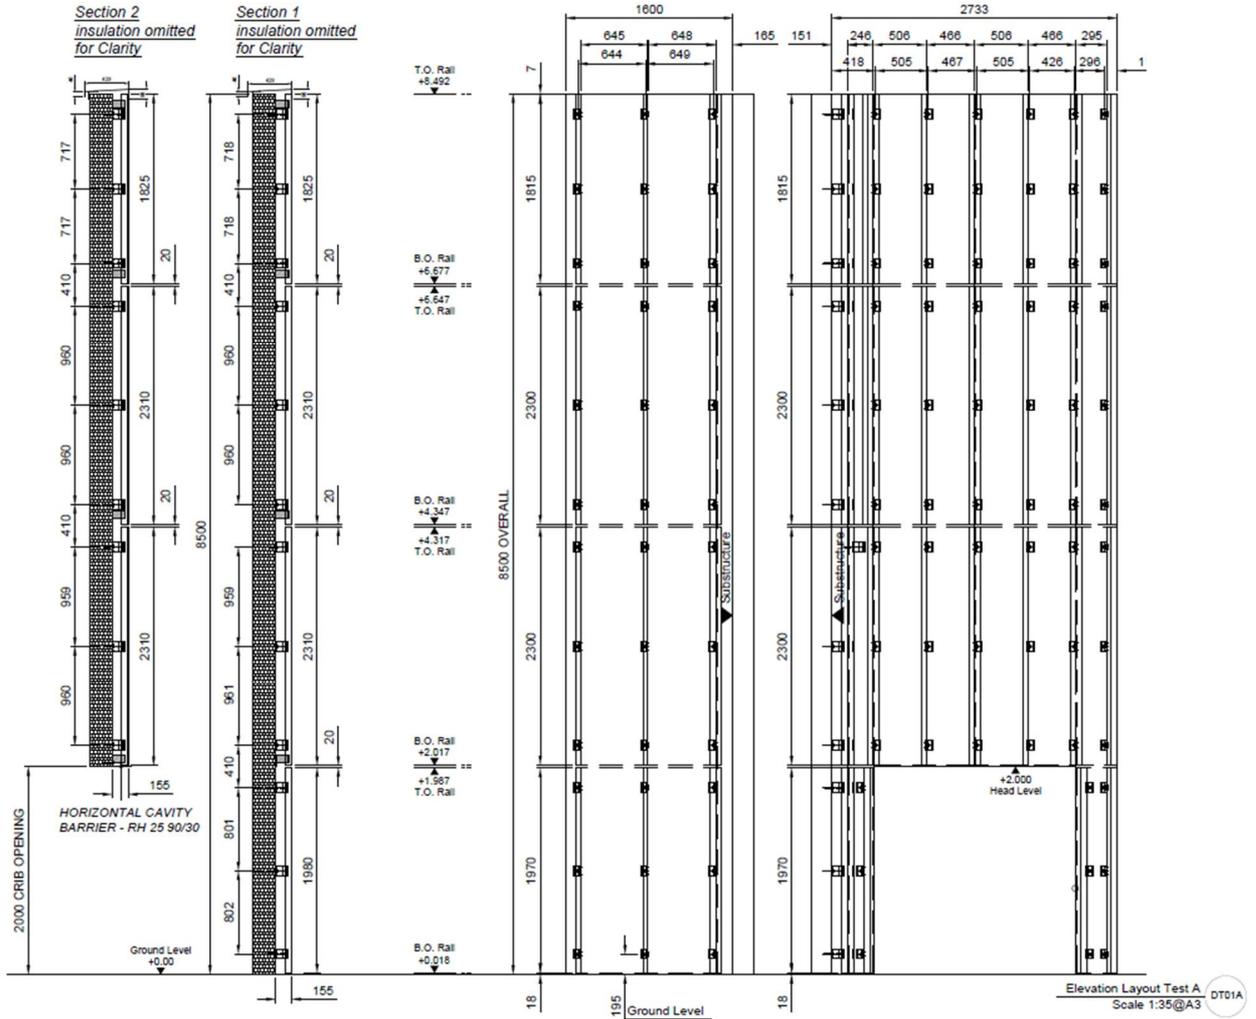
Front elevation, side elevation and vertical sections for the substructure system (supplied by the Test Sponsor).
